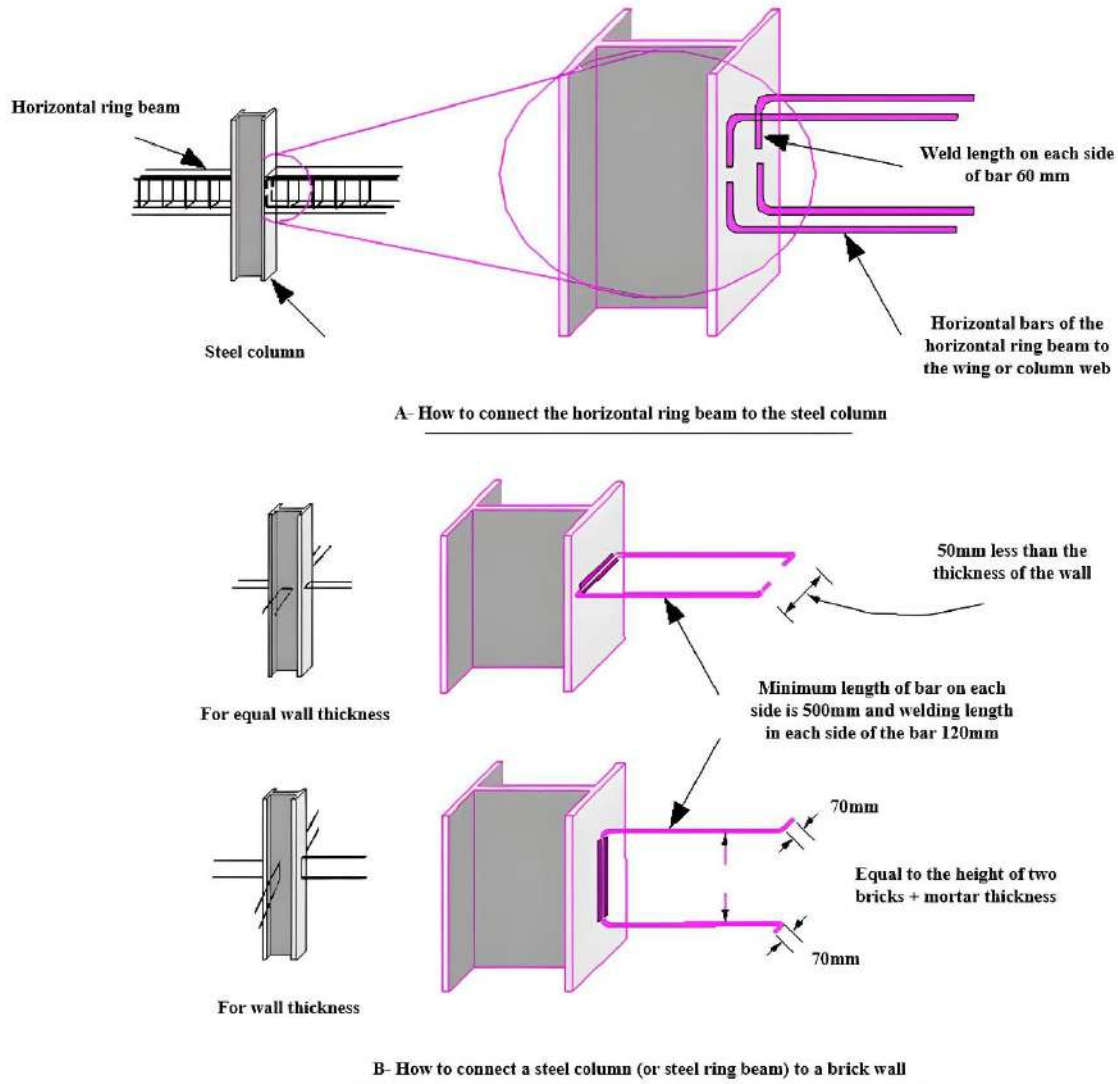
The details of connecting the horizontal ring beam and the brick wall to the steel column according to the 2800 Standard
